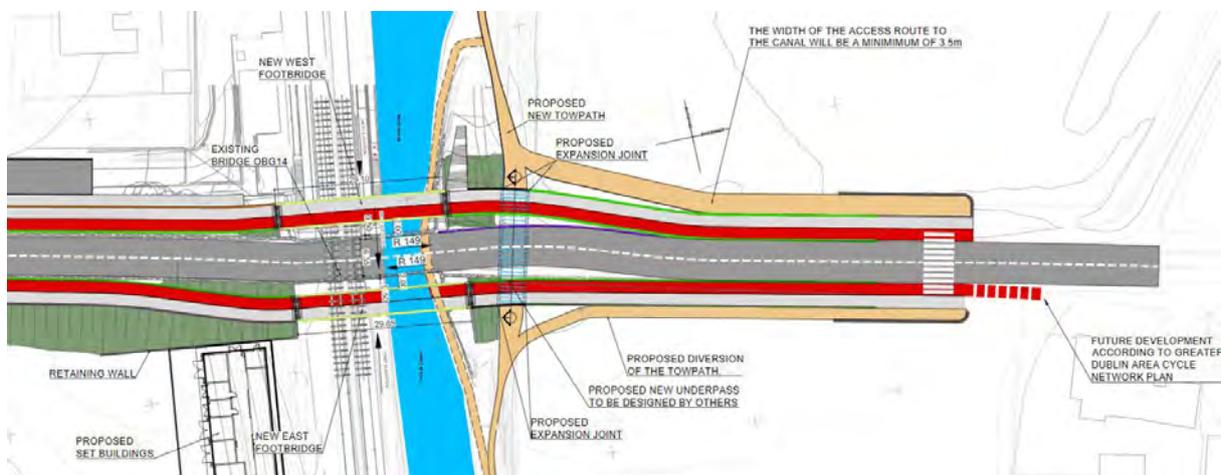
Plan of proposed footbridges to east and west of OBG14
